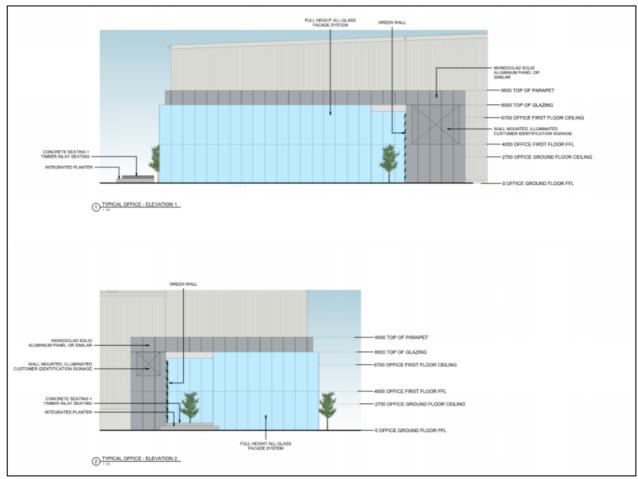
Typical Office Elevations (Source: Frasers 2021)
